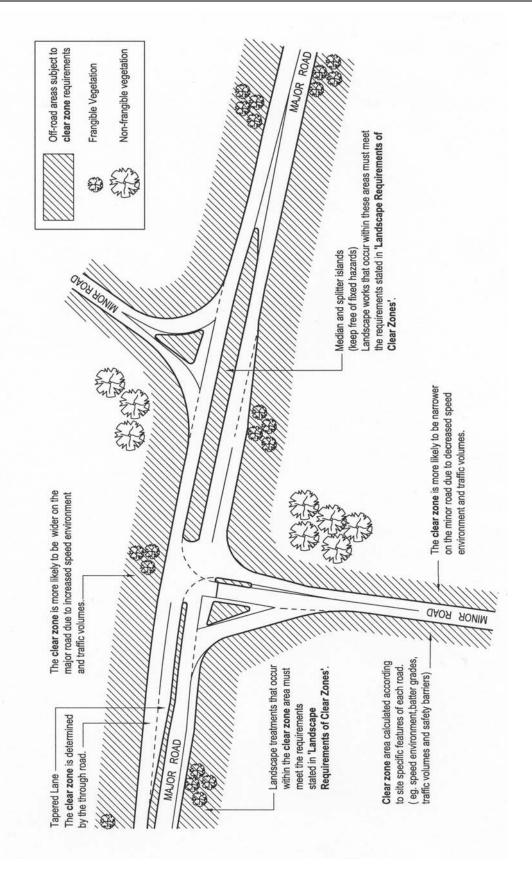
Off-road areas subject to clear zone requirements at an intersection – Plan
